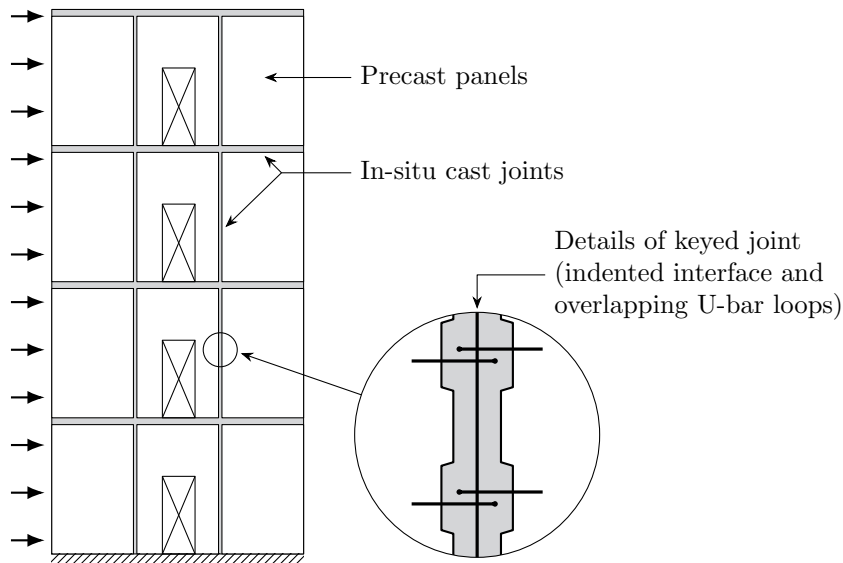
Four-storey shear wall constructed from precast panels connected by in-situ cast joints.
